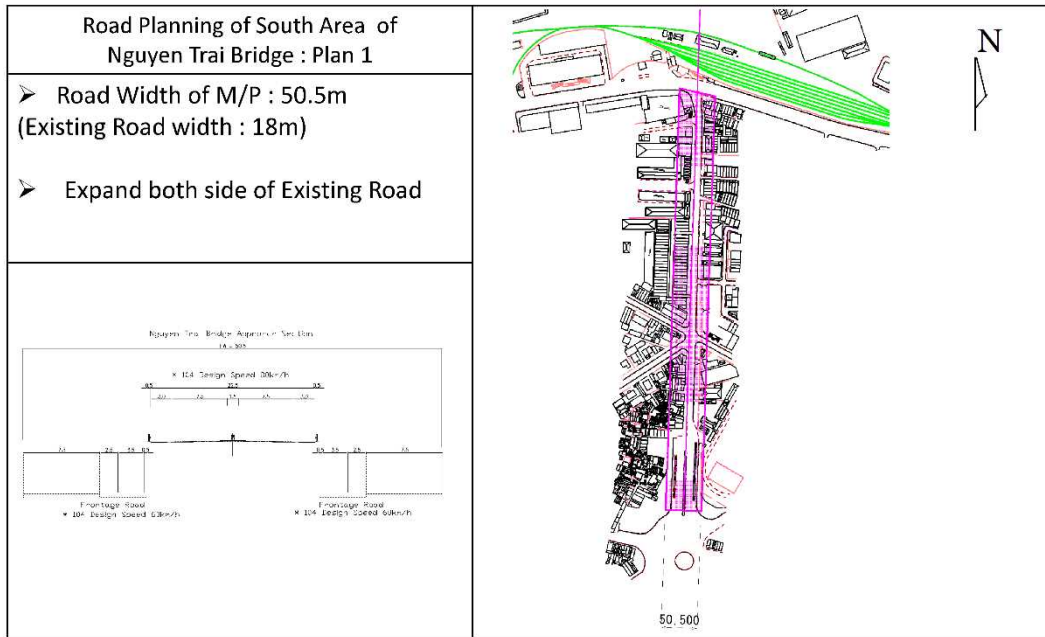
Both Sides of Nguyen Trai Road Widening Plan (W=50.5m)
